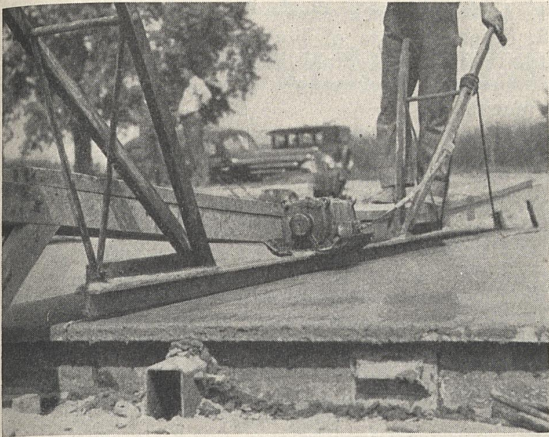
T-BAR AND VIBRATOR USED IN FORMING GROOVES FOR WEAKENED-PLANE JOINTS.
